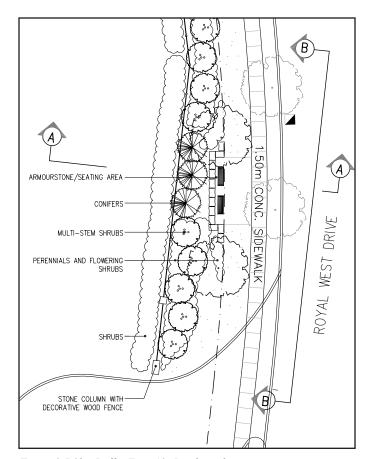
Buffer Type A2: Loading along street - Typical Plan
